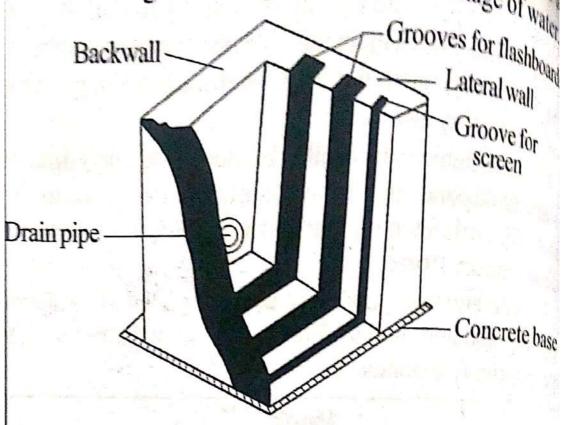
Sectional view of a Monk to show the grooves in the lateral walls and a drain pipe in the backwall.
